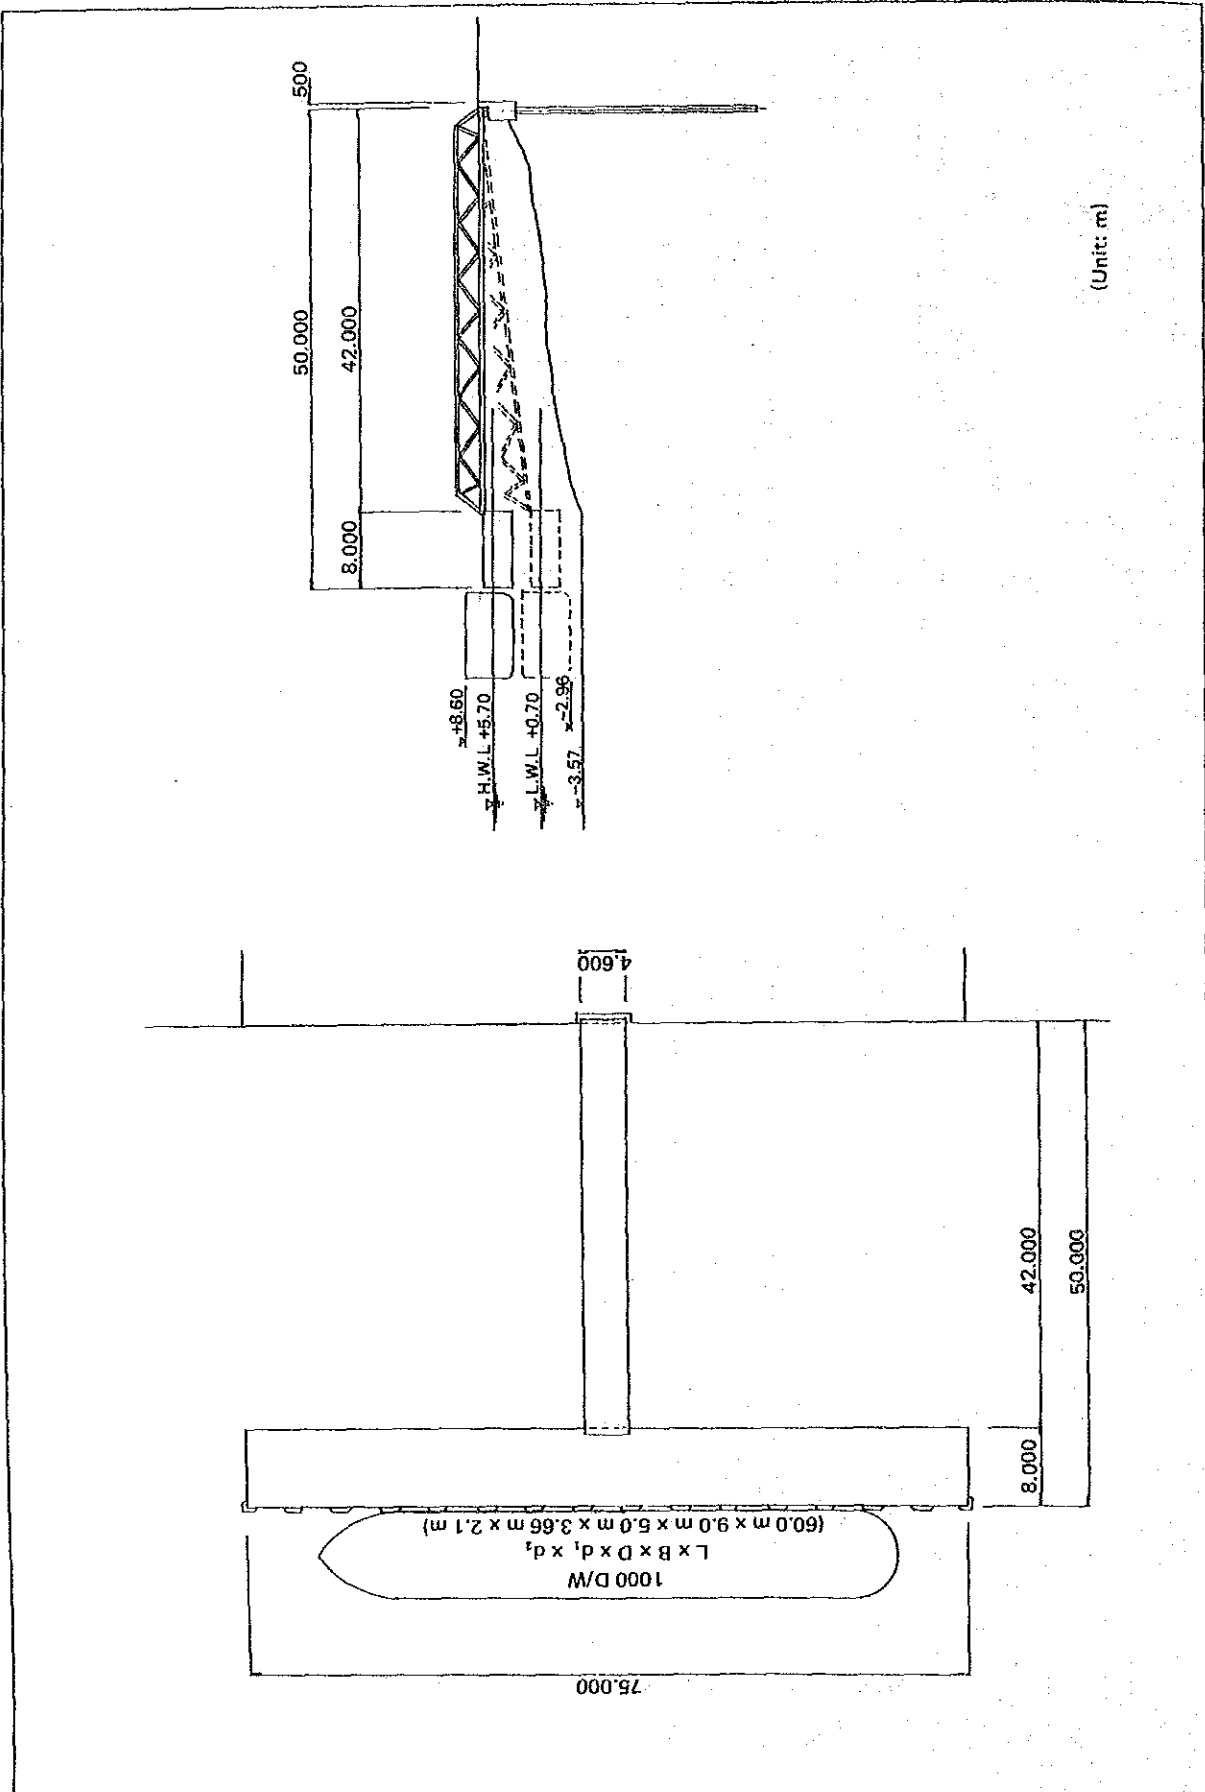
Floating Wharf (single span approach bridge) for Cargo Terminal of Improved Mooring Facilities
